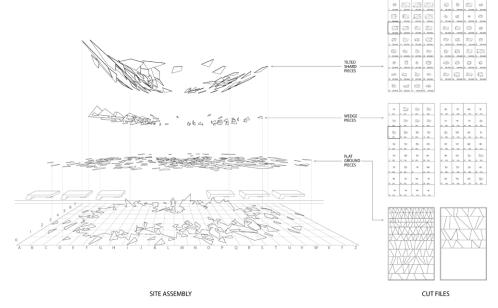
Cutting Layout from 1.5 Jumbo Glass Sheet.
